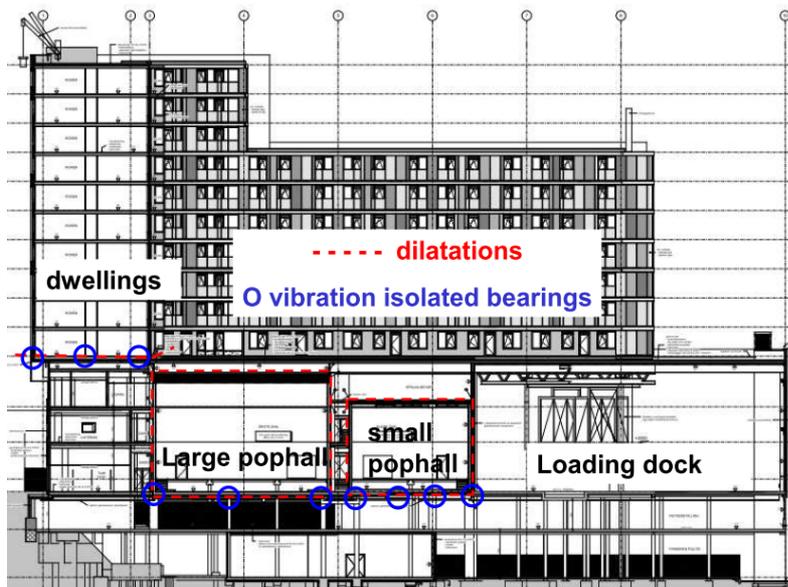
Cross-section through building of Doornroosje, with dwellings above the pop centre
